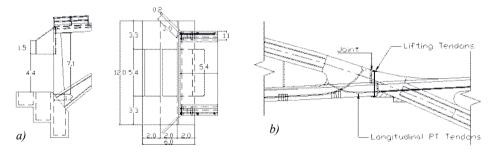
a) Detail of the foundations of the arch and the deck; *b)* Detail of the joint of the arch by construction sequence.
